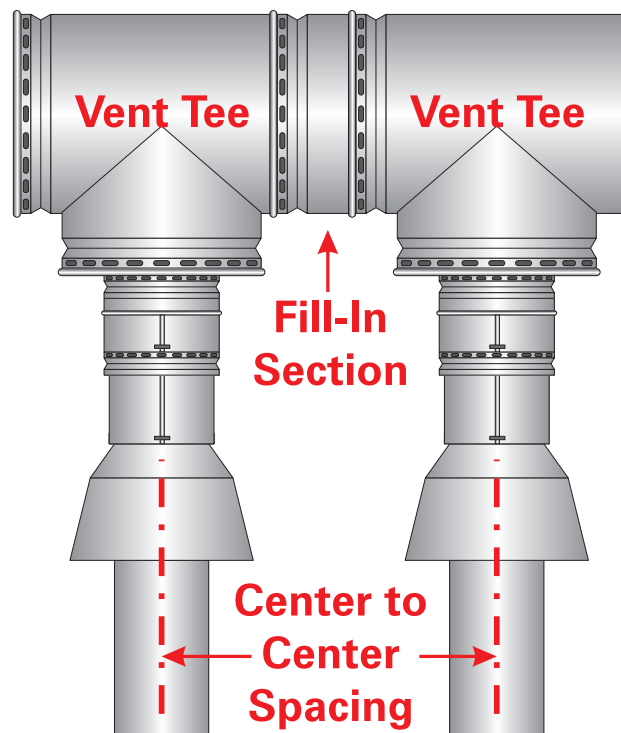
Consider Minimum Centers for Vent System when Laying Out Boiler Plan
